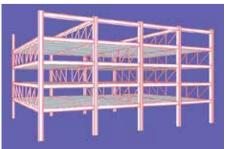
Typical 3-D model of standard staggered trusses supporting hollow core slabs
